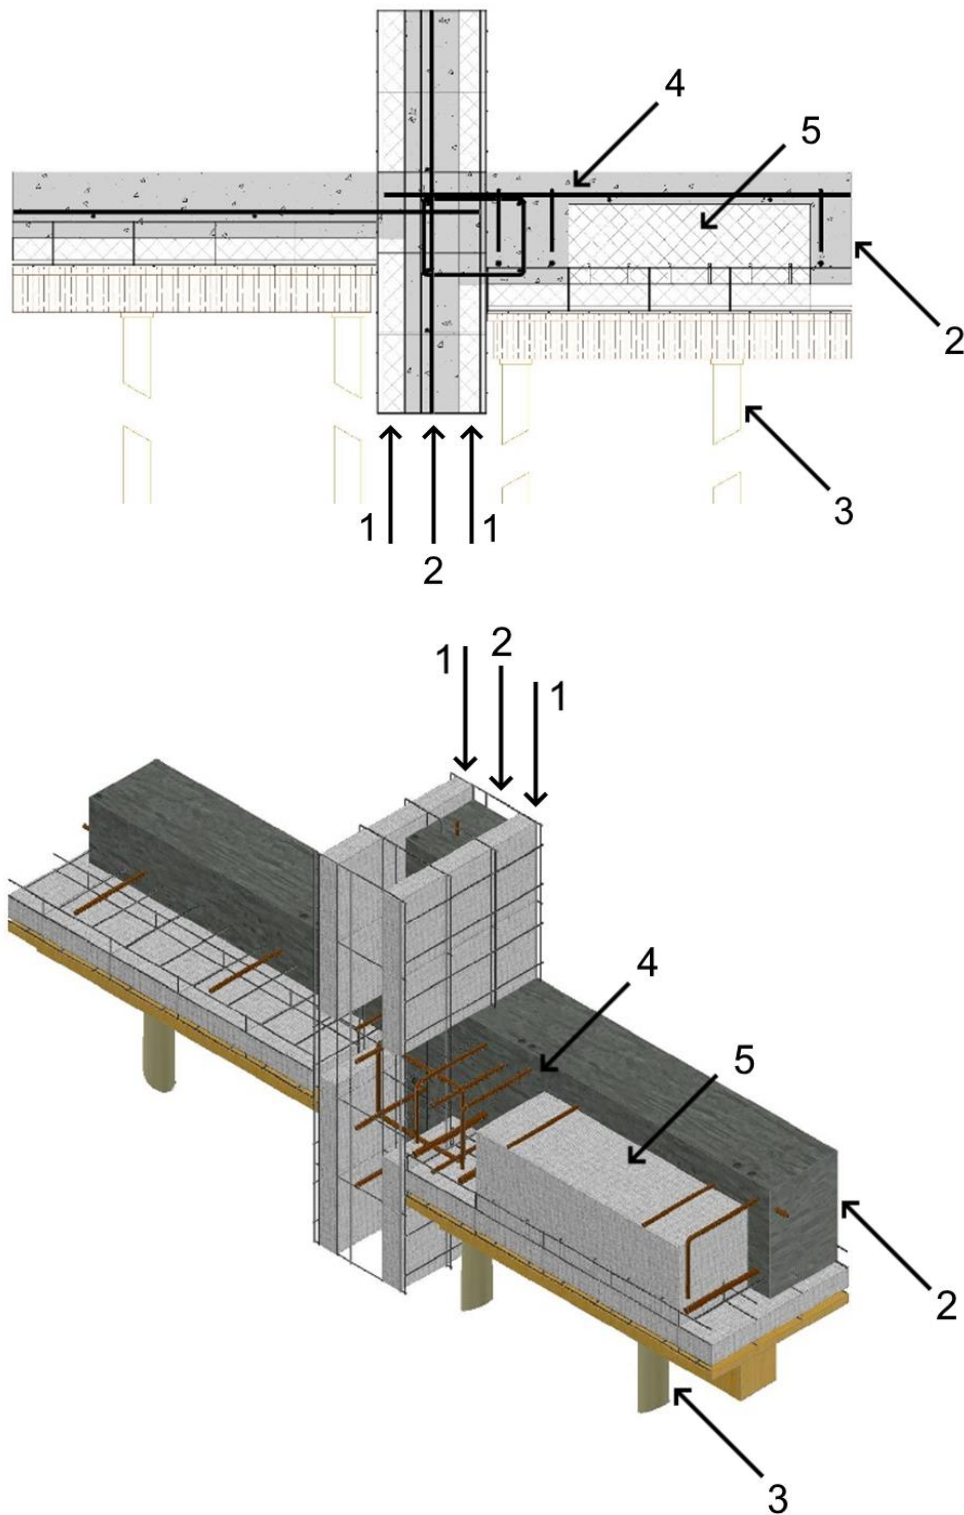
Example of a shuttering kit floor, including additional rebar
